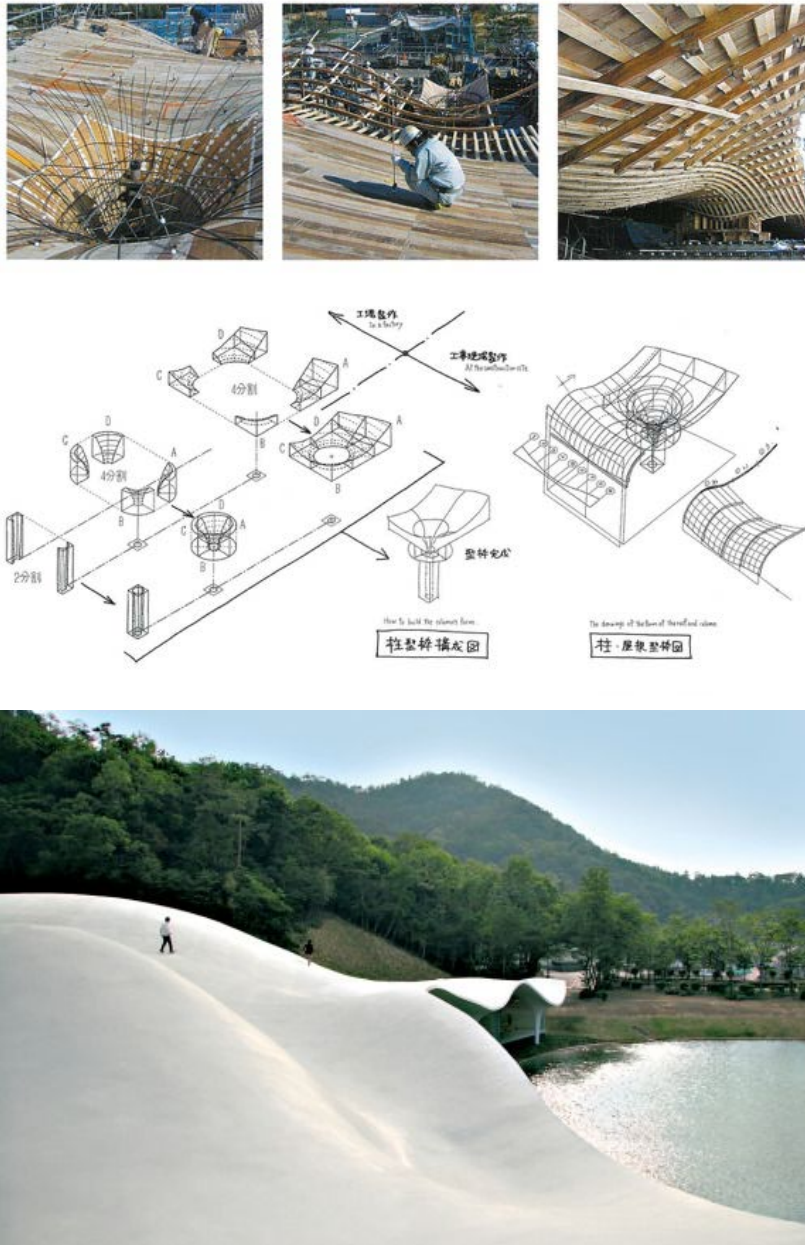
'Meiso no Mori' Municipal Funeral Hall, 2004-06, Kakamigahara Japan. Concrete roof. Photos: Detail: DETAIL 2008.07-08
